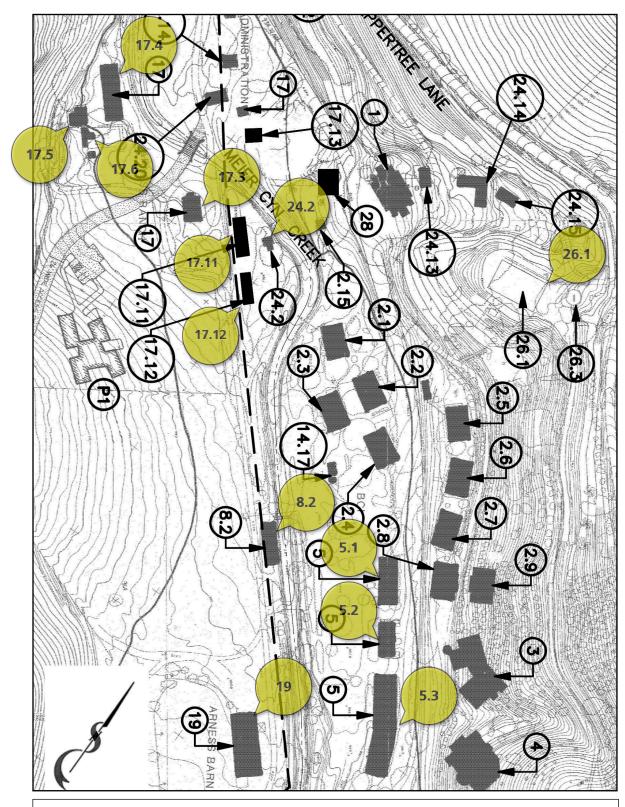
Site Plan of Buildings Documented in Report [Source: M³ Civil, Inc. with notations by San Buenaventura Research Associates]
